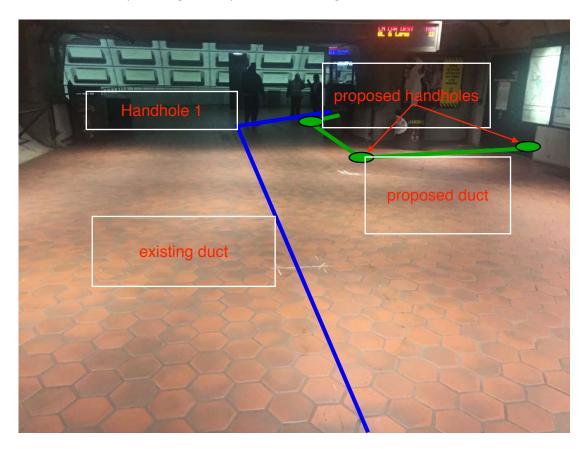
G02 Capitol Heights: Proposed and existing duct runs into backrooms
